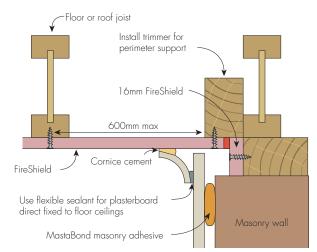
Fire Rated Ceiling to Masonry Wall Direct fixed to joist
